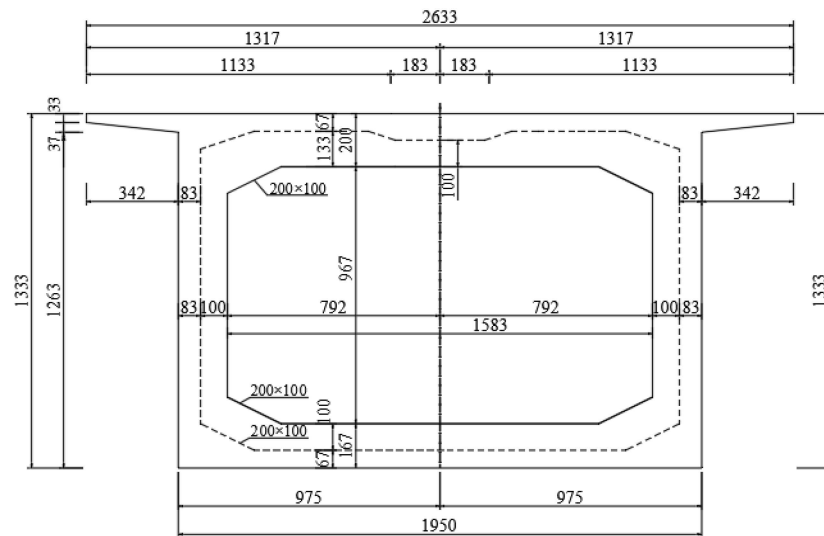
Section of end thickening and anchor reinforcement (C-C section, unit: mm).
